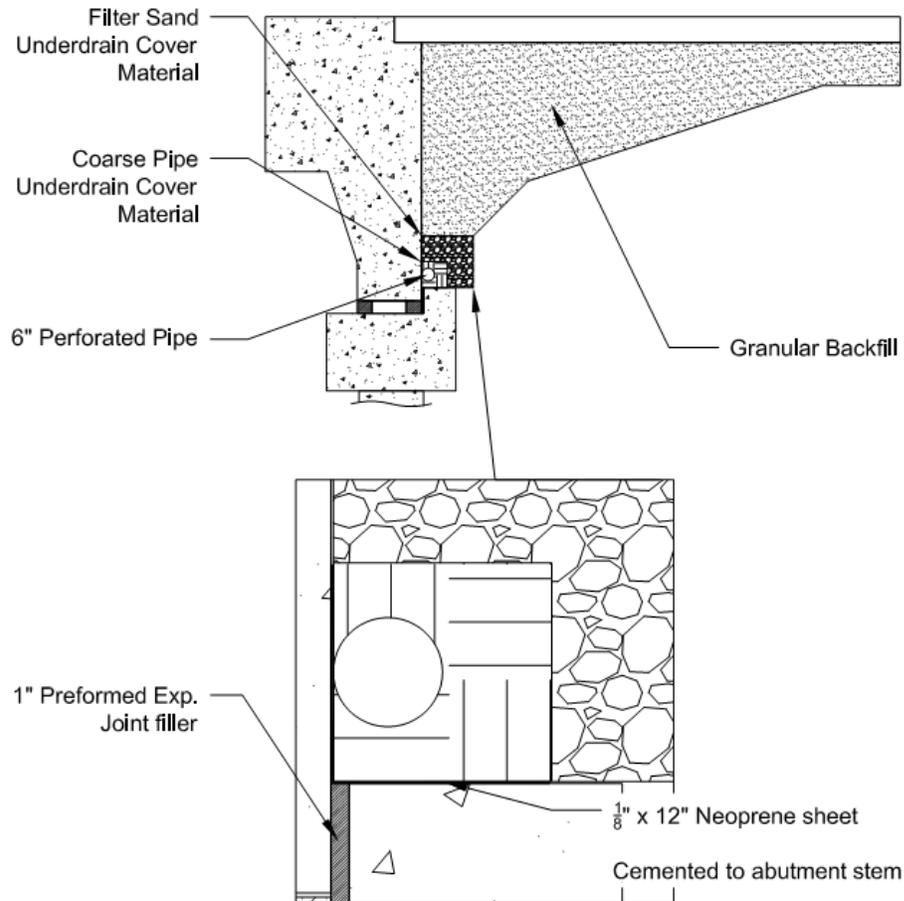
Underdrain Design, After ODOT Proposed Plan U.S. 177 over Salt Fork
